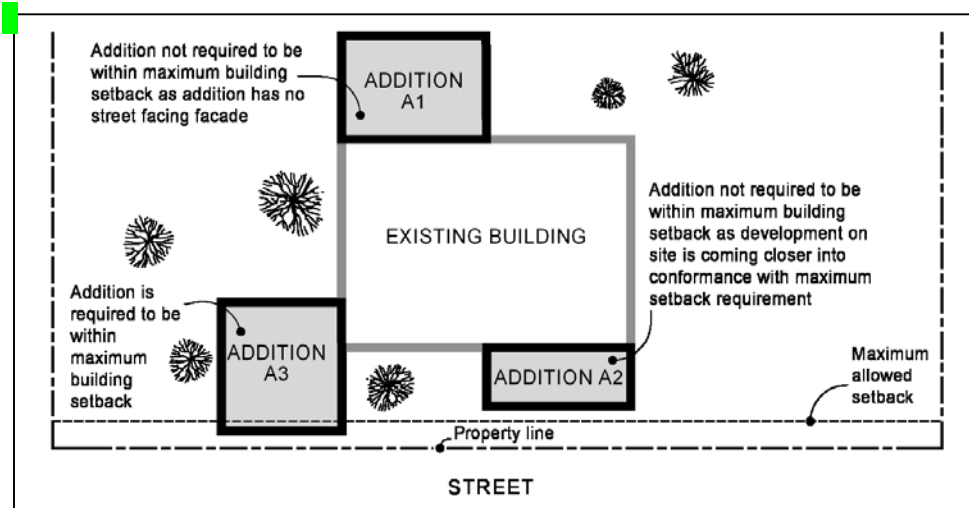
is being revised to show that additions that are next to (rather than in front of or behind) an existing building must meet the maximum setback for 100 percent of its street facing façade until the total building façade (existing and addition) meet the 50 percent standard. The existing figure is shown below. Addition 3 shows the situation where an addition creates additional street frontage. In that case, the addition must meet the maximum transit setback for its entire length. Once the overall street frontage meets the applicable standard - 1 or 2
